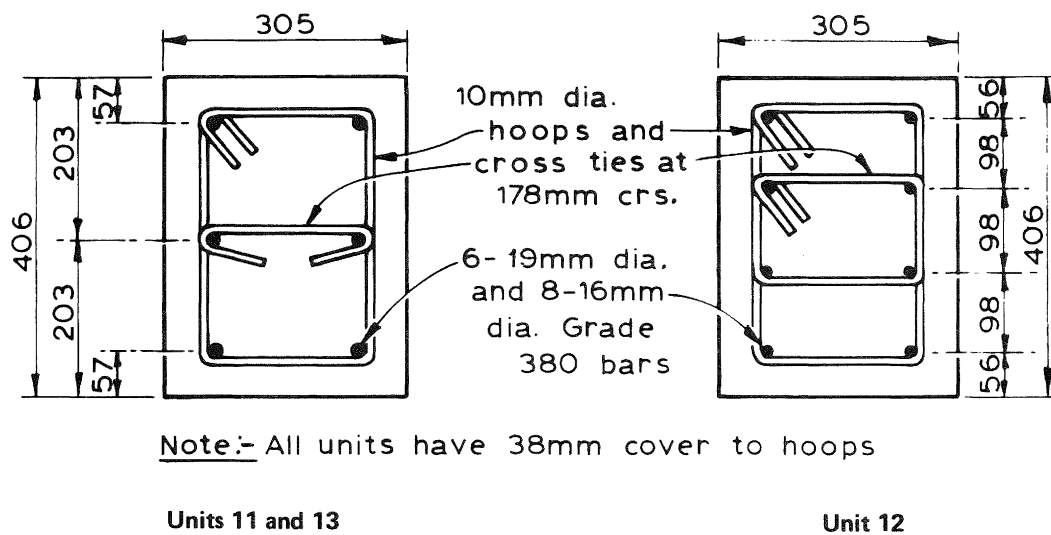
COLUMN SECTIONS OF TEST UNITS
